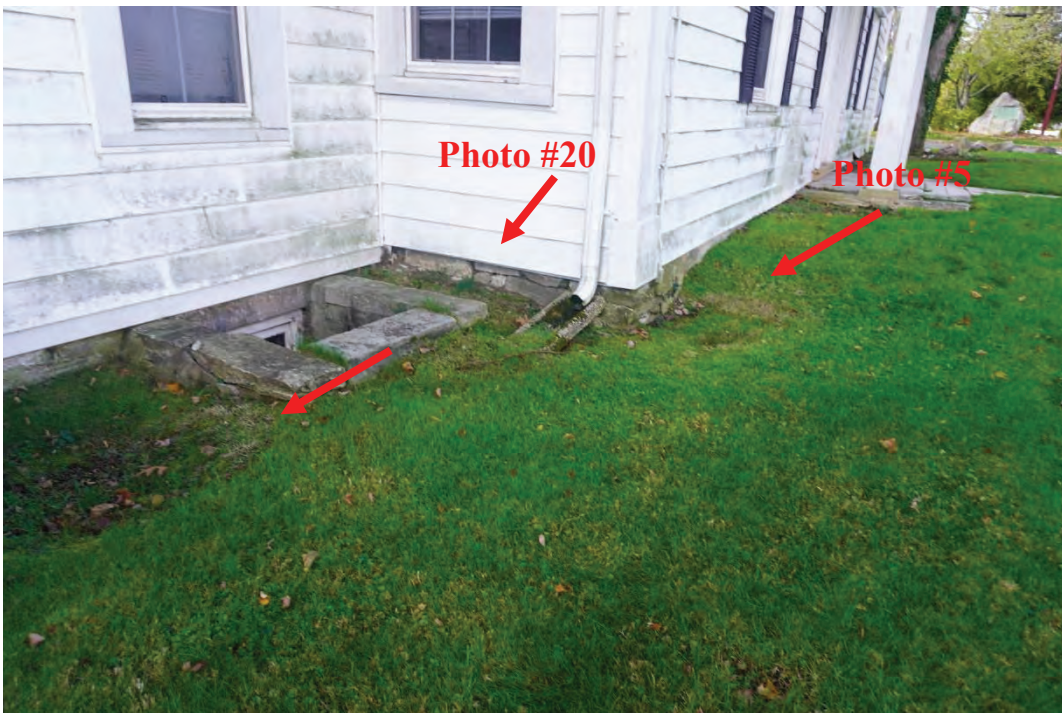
Negative grading front of home between entrance and northeast corner of original structure. Water pooling up against foundation wall and most likely infiltrating into crawlspace.
